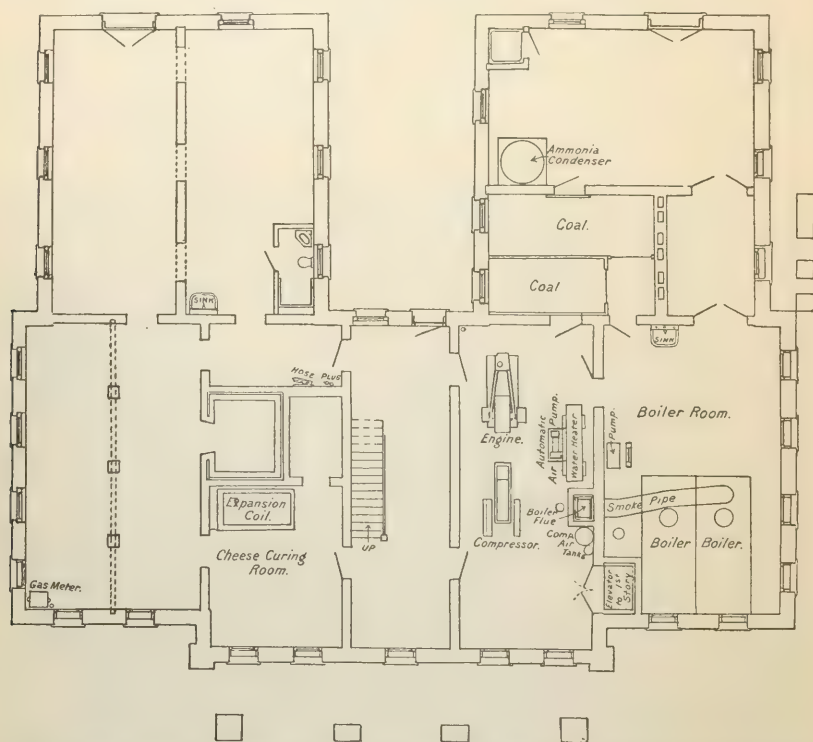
Basement plan of Biological and Dairy Building, New York State Experiment Station.
